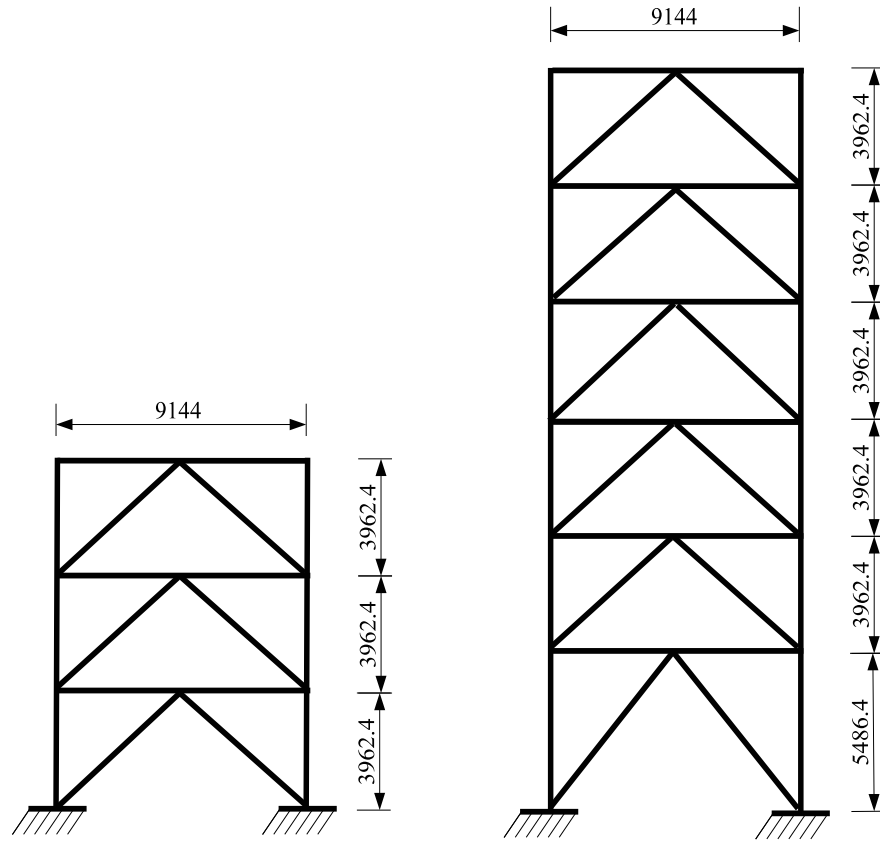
Elevation view of the 3- and 6-storey frame. Dimensions are expressed in mm.
